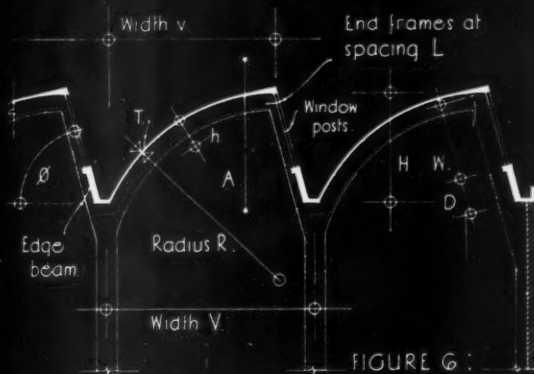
CROSS SECTION OF NORTH LIGHT SHOWING END FRAMES
